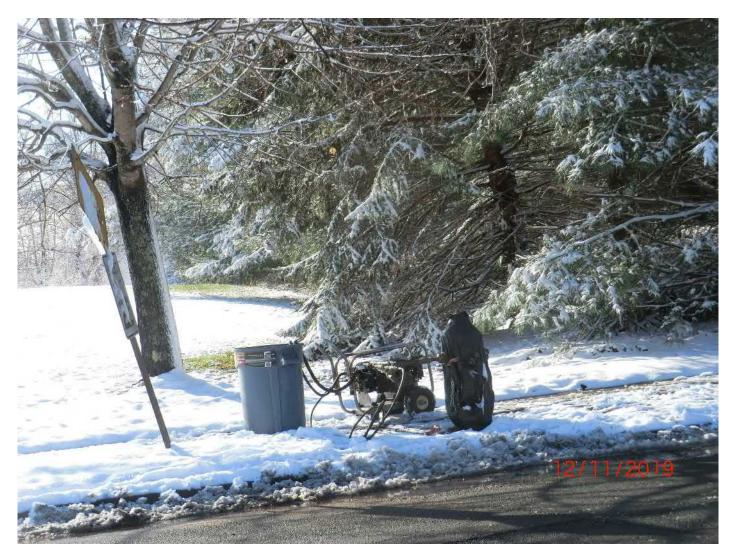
Facing southwest, new hydrant located at bottom of Talcott Ridge and S. Main Street (below the repaired leak).
